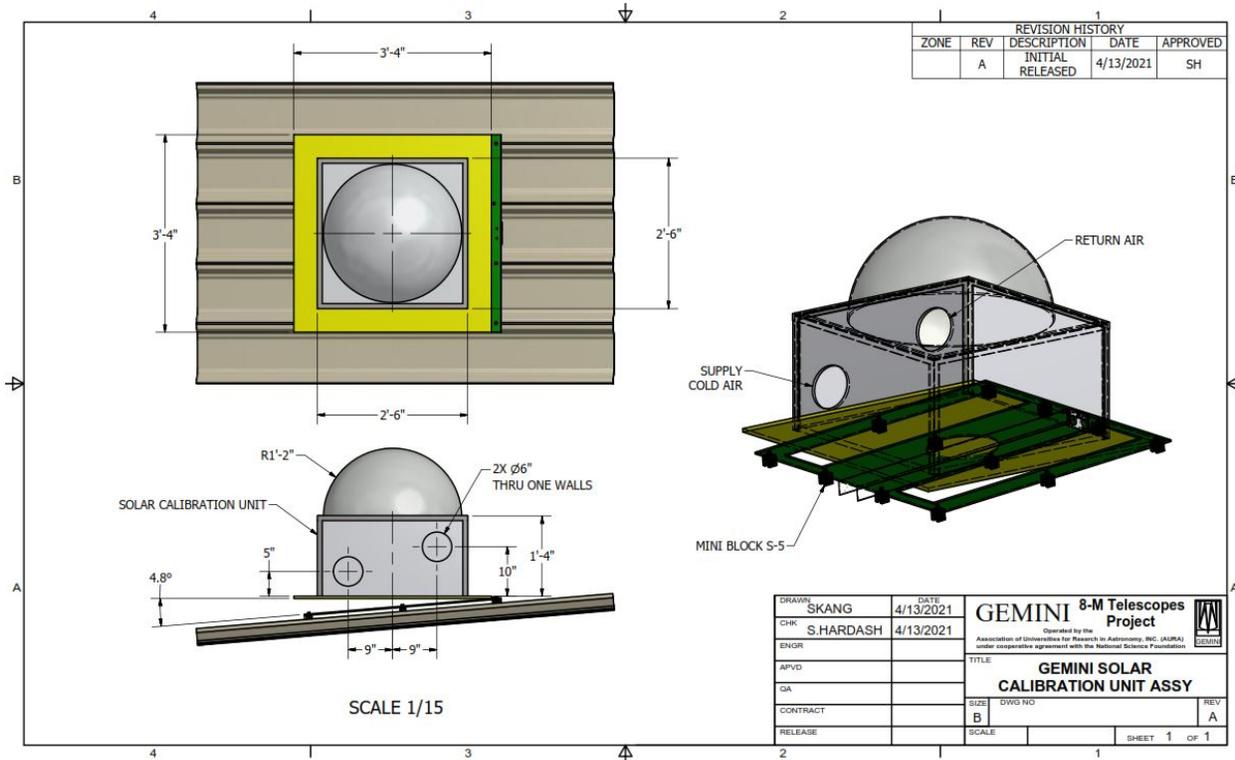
Detail of the solar calibration unit enclosure as it will mount to the Support Facility roof.
